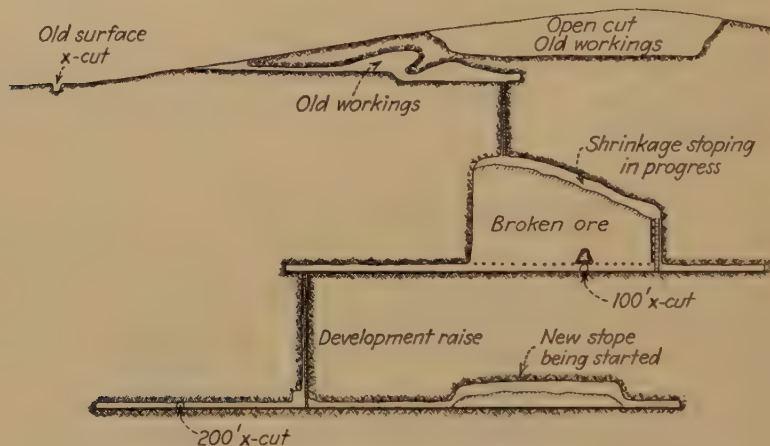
LONGITUDINAL SECTION OF TYPICAL HOG MOUNTAIN VEIN.
